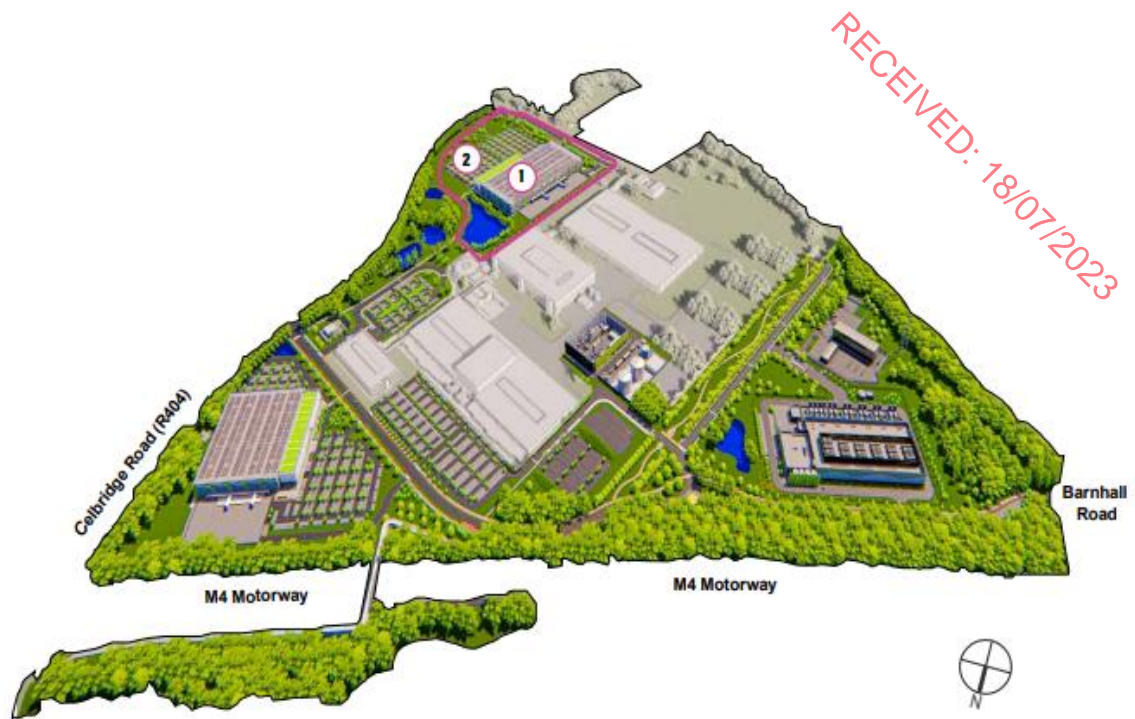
Kildare Innovation Campus Phase 2 Plan (Purple Outline). Source: RKD Architectural Design Statement
